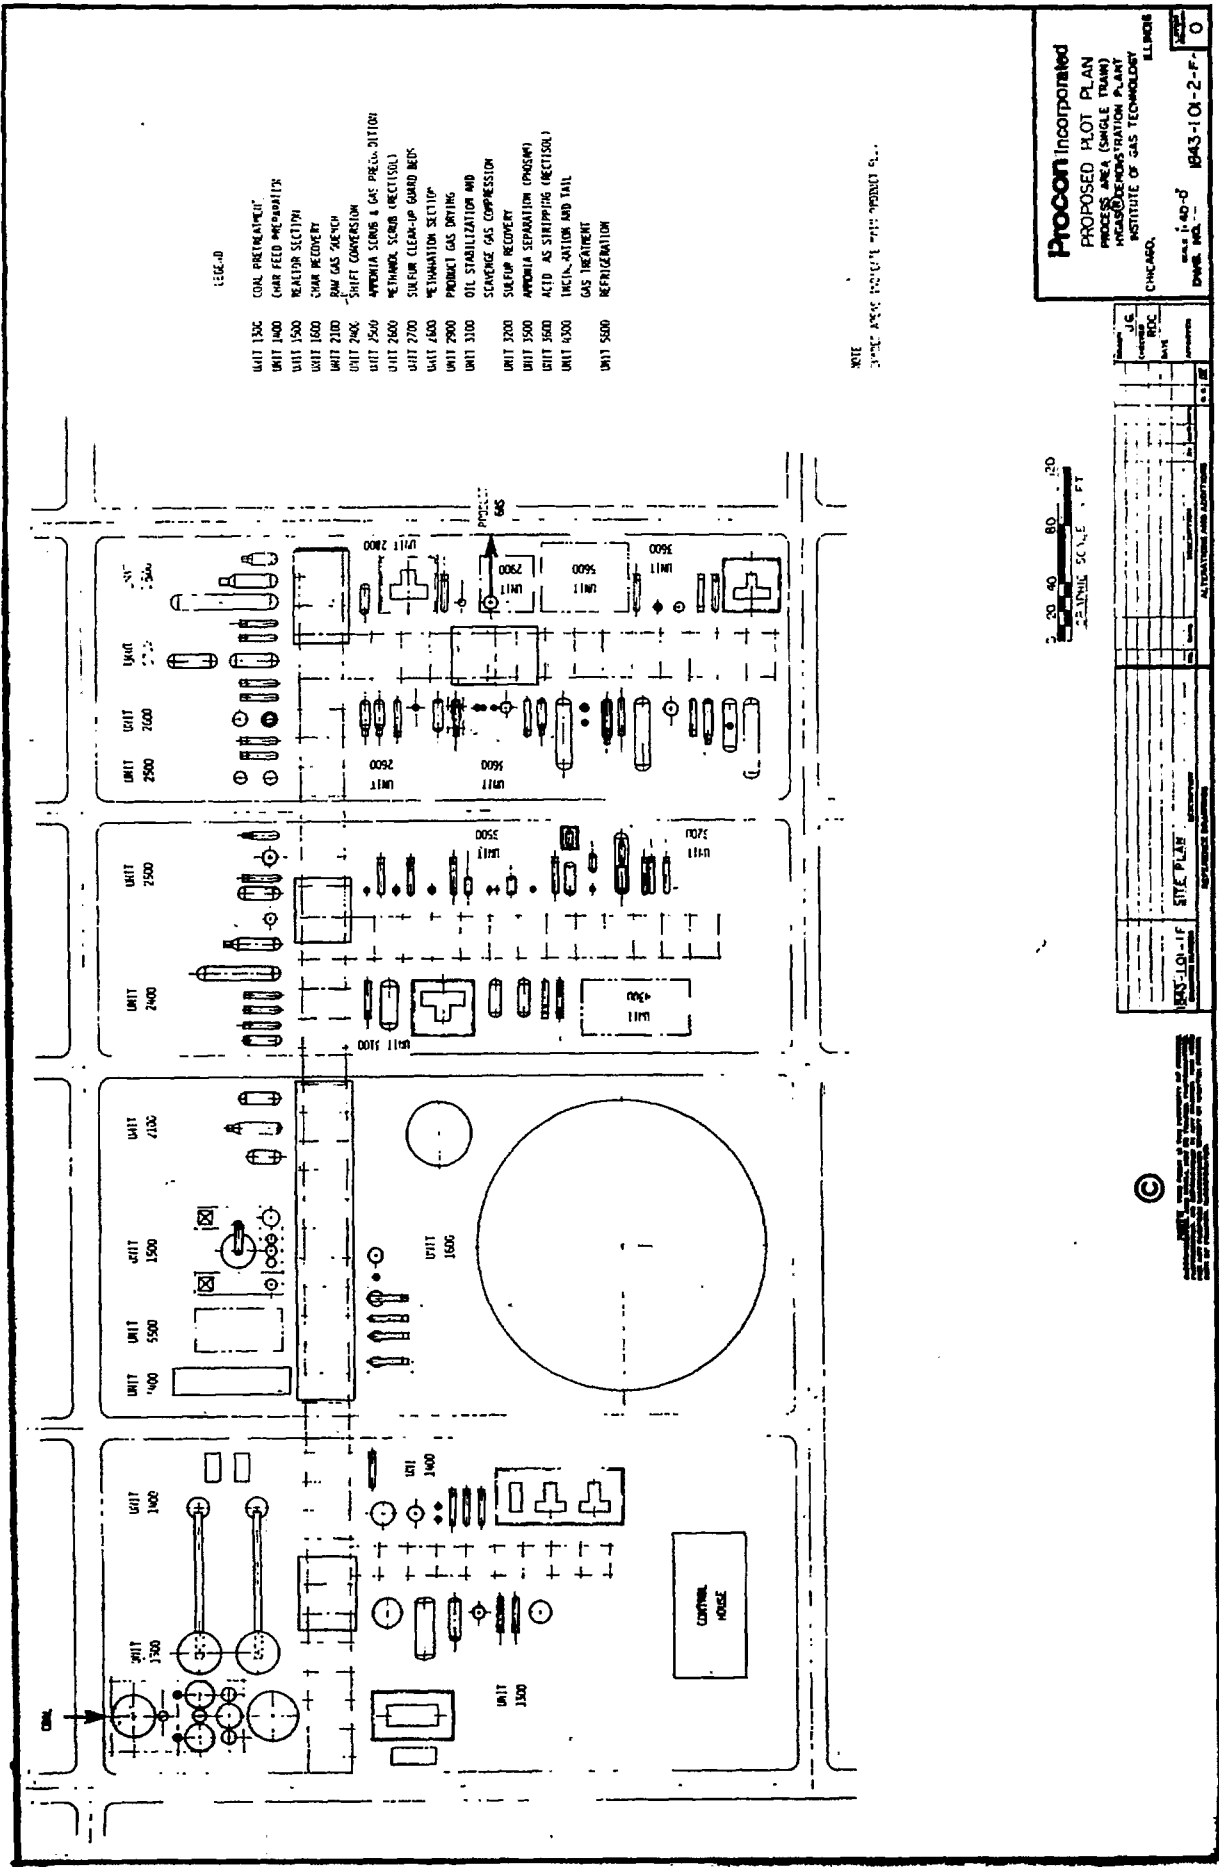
PROPOSED SINGLE-TRAIN PROCESS AREA PLOT PLAN
